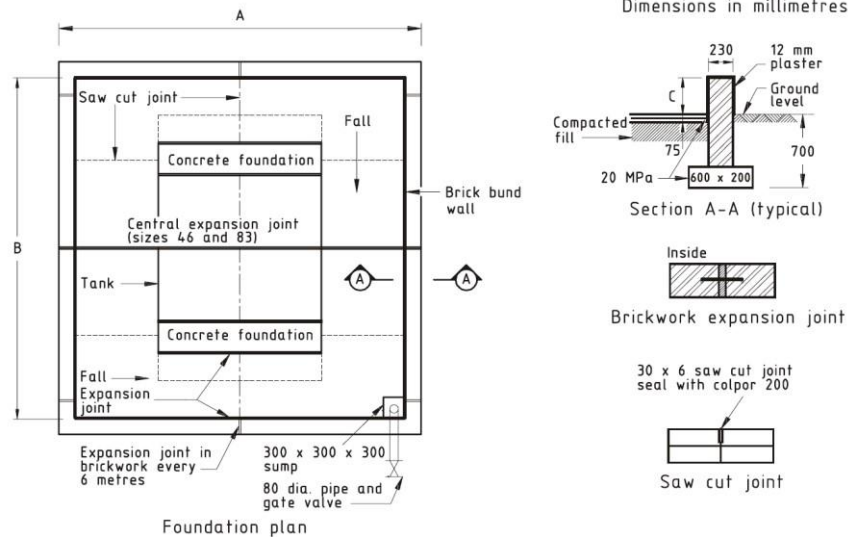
Typical horizontal cylindrical storage tank with bund wall for above-ground storage
